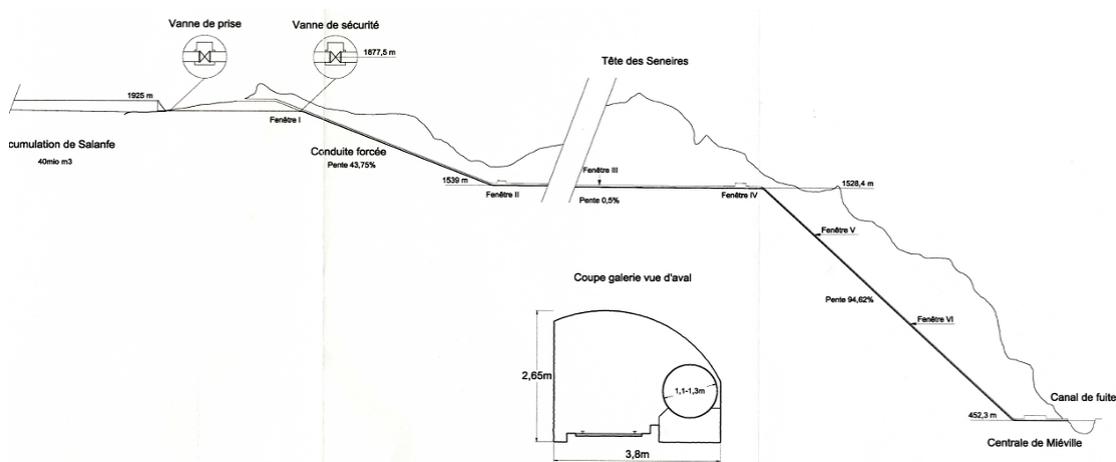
Longitudinal profile of the SALANFE hydropower plant installation
